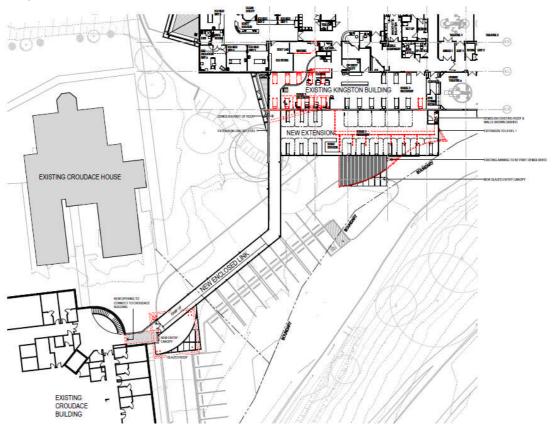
Part site plan showing the new Linkway between buildings over the existing car park.
